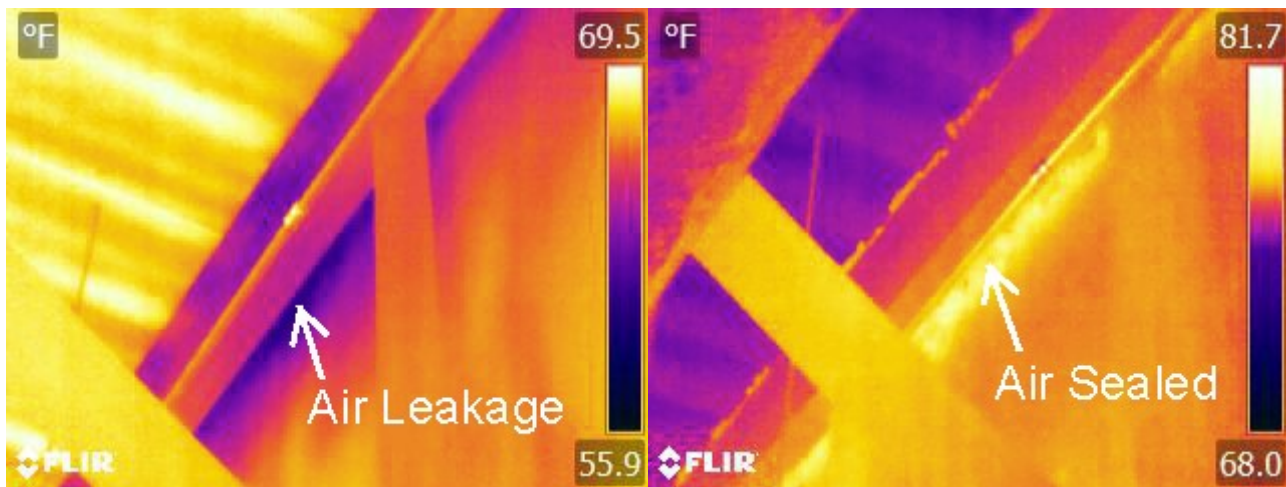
2nd floor mechanical room before and after sealing - air leak is at bottom of beam along the wall.
